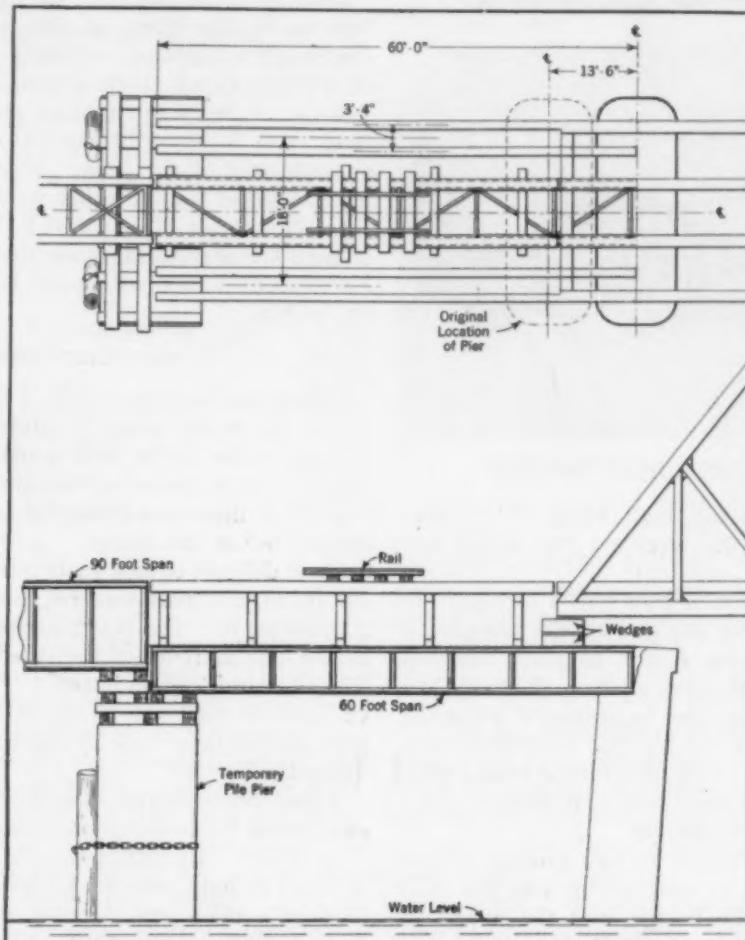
PLAN AND ELEVATION OF 60-FT. TEMPORARY SPAN
